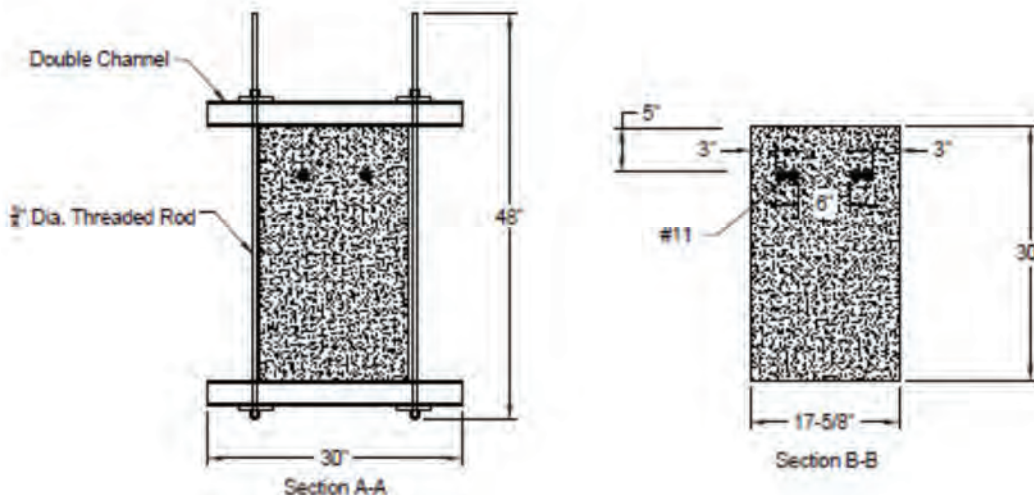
Cross-Sectional Dimensions of Series A and B Girders (From Appendix A)
